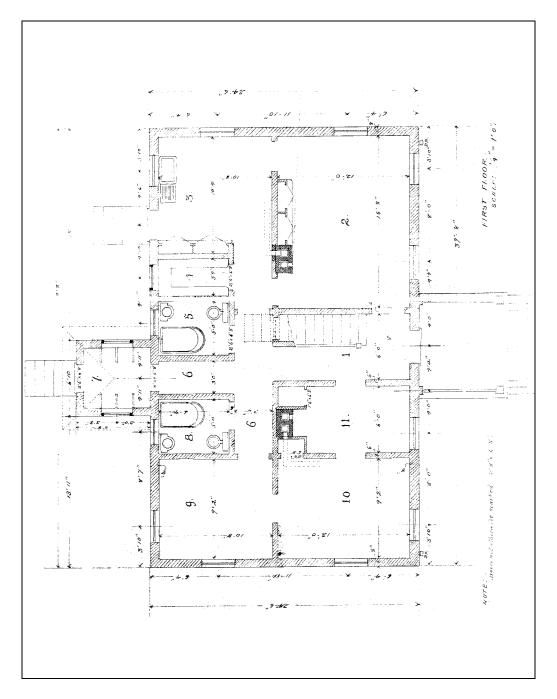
Siuslaw River Lifeboat Station, First Floor Plan, October 1916. Source: U.S. Coast Guard Civil Engineering Unit, Oakland, CA.
